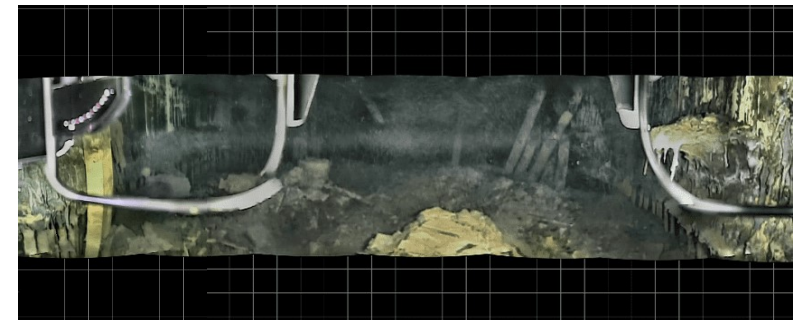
Degradation of concrete in the vicinity of the pedestal opening (right wall of the opening)
